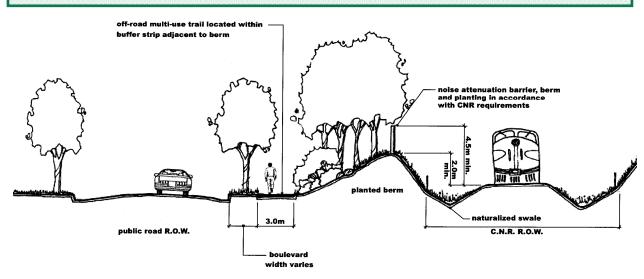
Typical Cross-Section of a Trail Facility Adjacent to a Rail Corridor Separated by a Planted Berm Source: ESG International Public Open Space Plan, Town of Whitchurch, Stouffville, Functional Servicing Study, Southeast Quadrant OPA 101 Secondary Plan, May 2002
